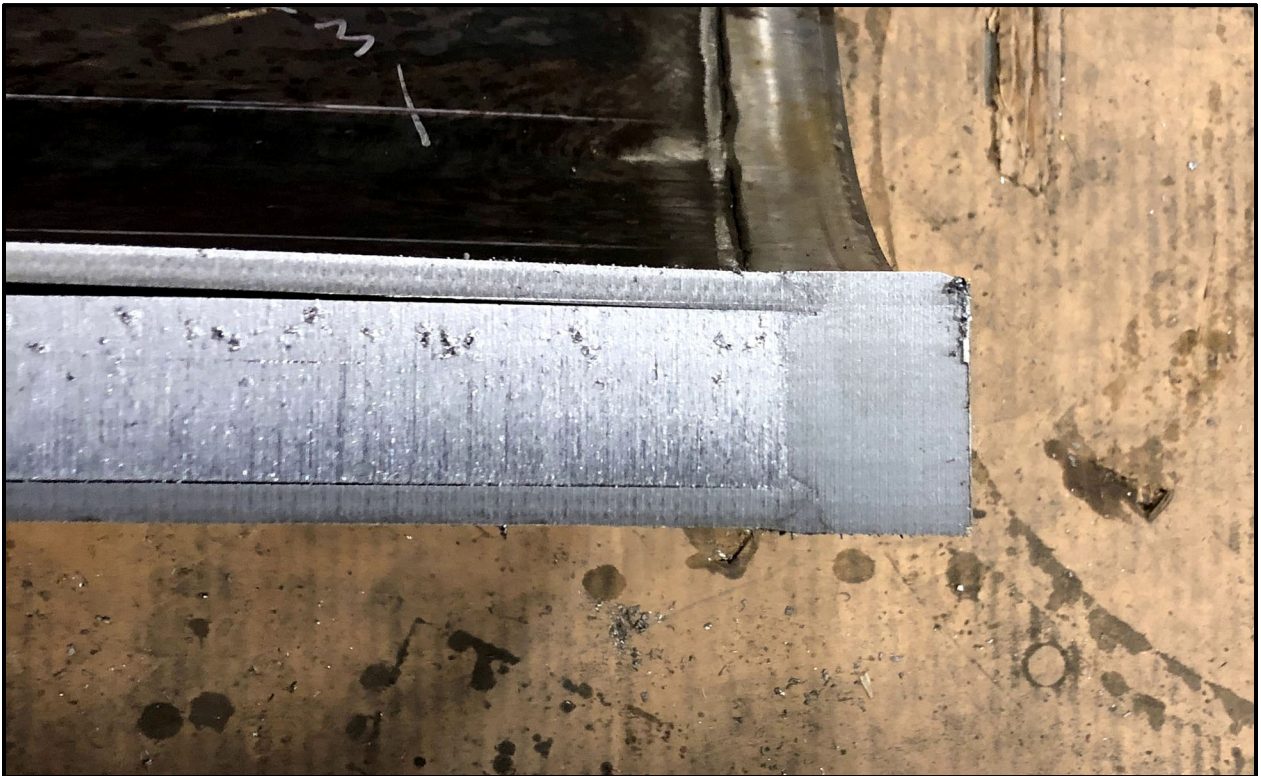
SC-30G2 18TU-02 Destructive Disassembly Cut T/U at Upper Flange
